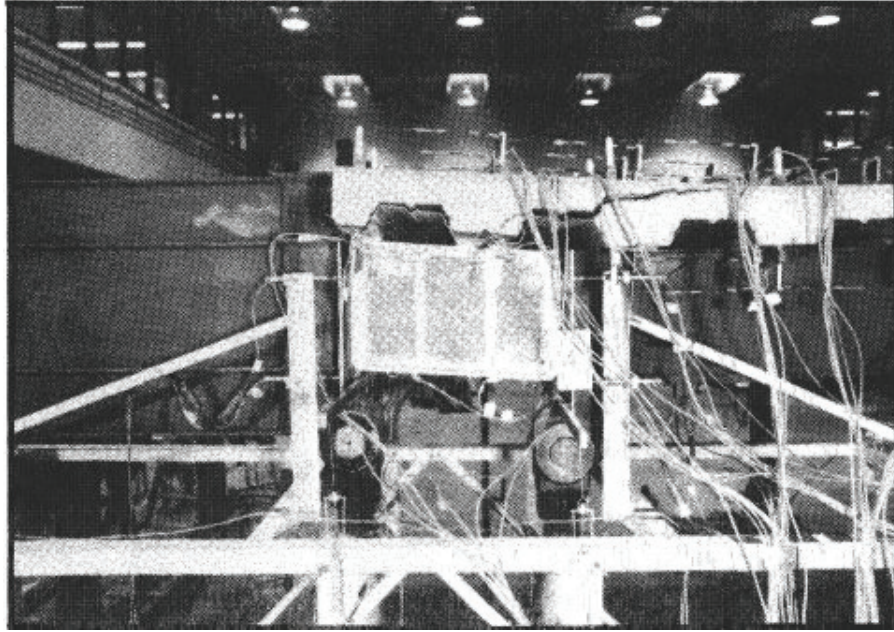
Concrete slab damage on EBF link C-2 tested by Ricles and Popov (1987)
